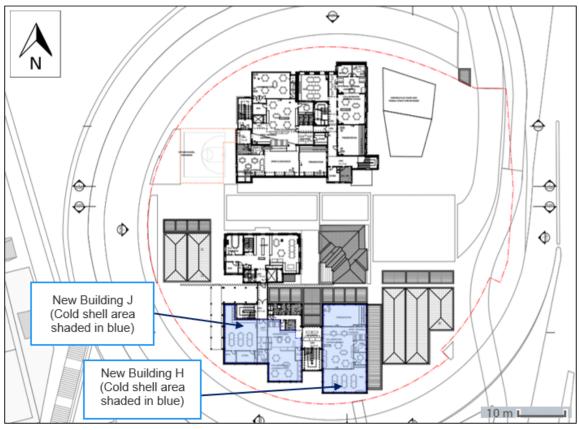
| Level 2 (first floor) (Source: Applicant's EIS 2020)
